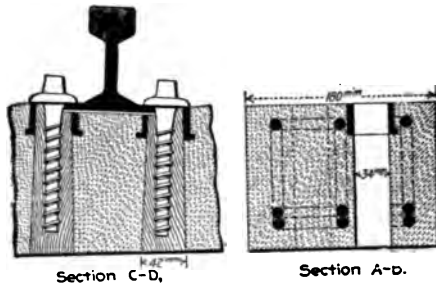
Rail Fastening Used with Tie Shown by Fig. 552.
